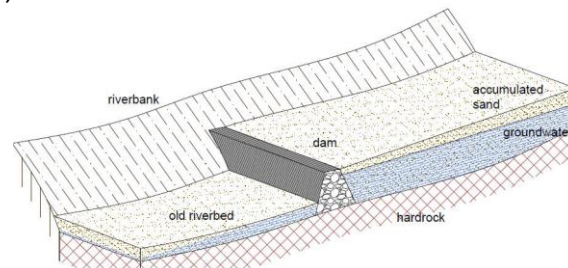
Schematic cross section of a typical sand storage dam (Borst & de Haas, 2006).
